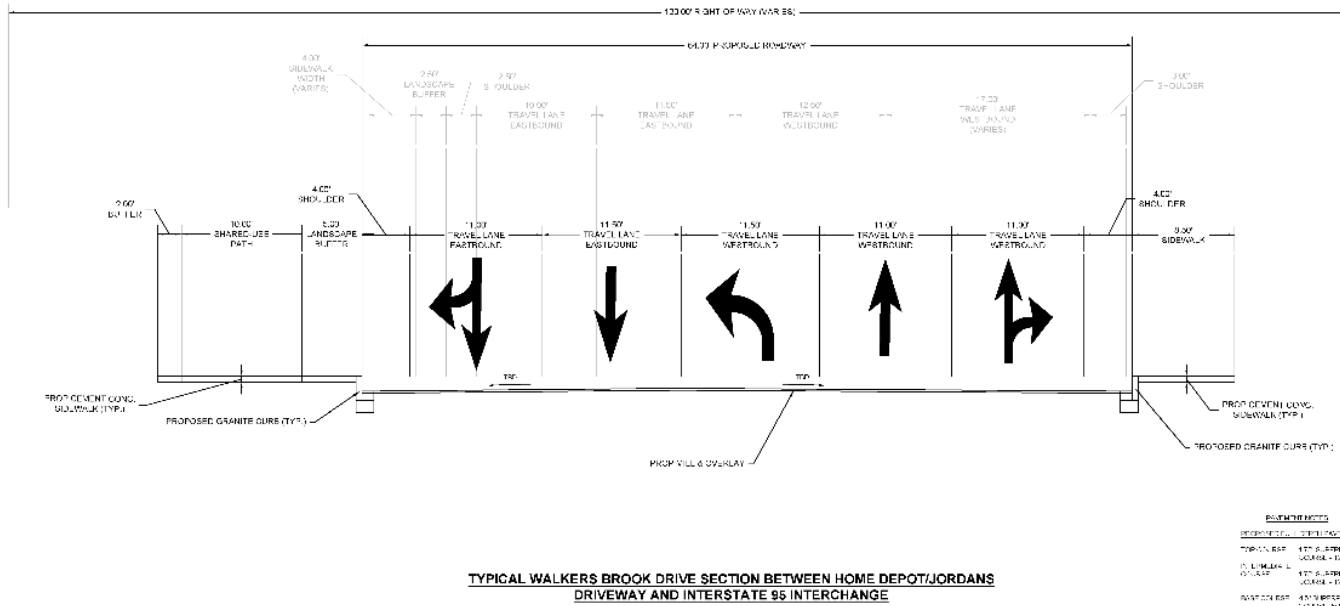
Alternative 2 (off-road shared use path) – Typical Section 2
